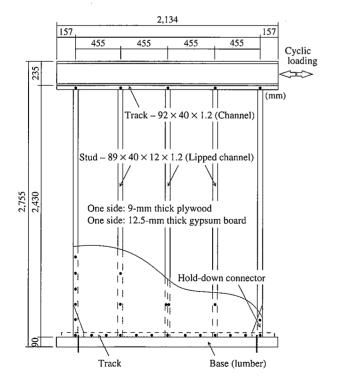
Schematic of steel-framed load-bearing wall specimen
